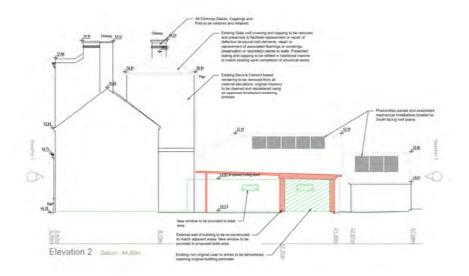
LCC 005 Proposed Elevation 2 (Side)
